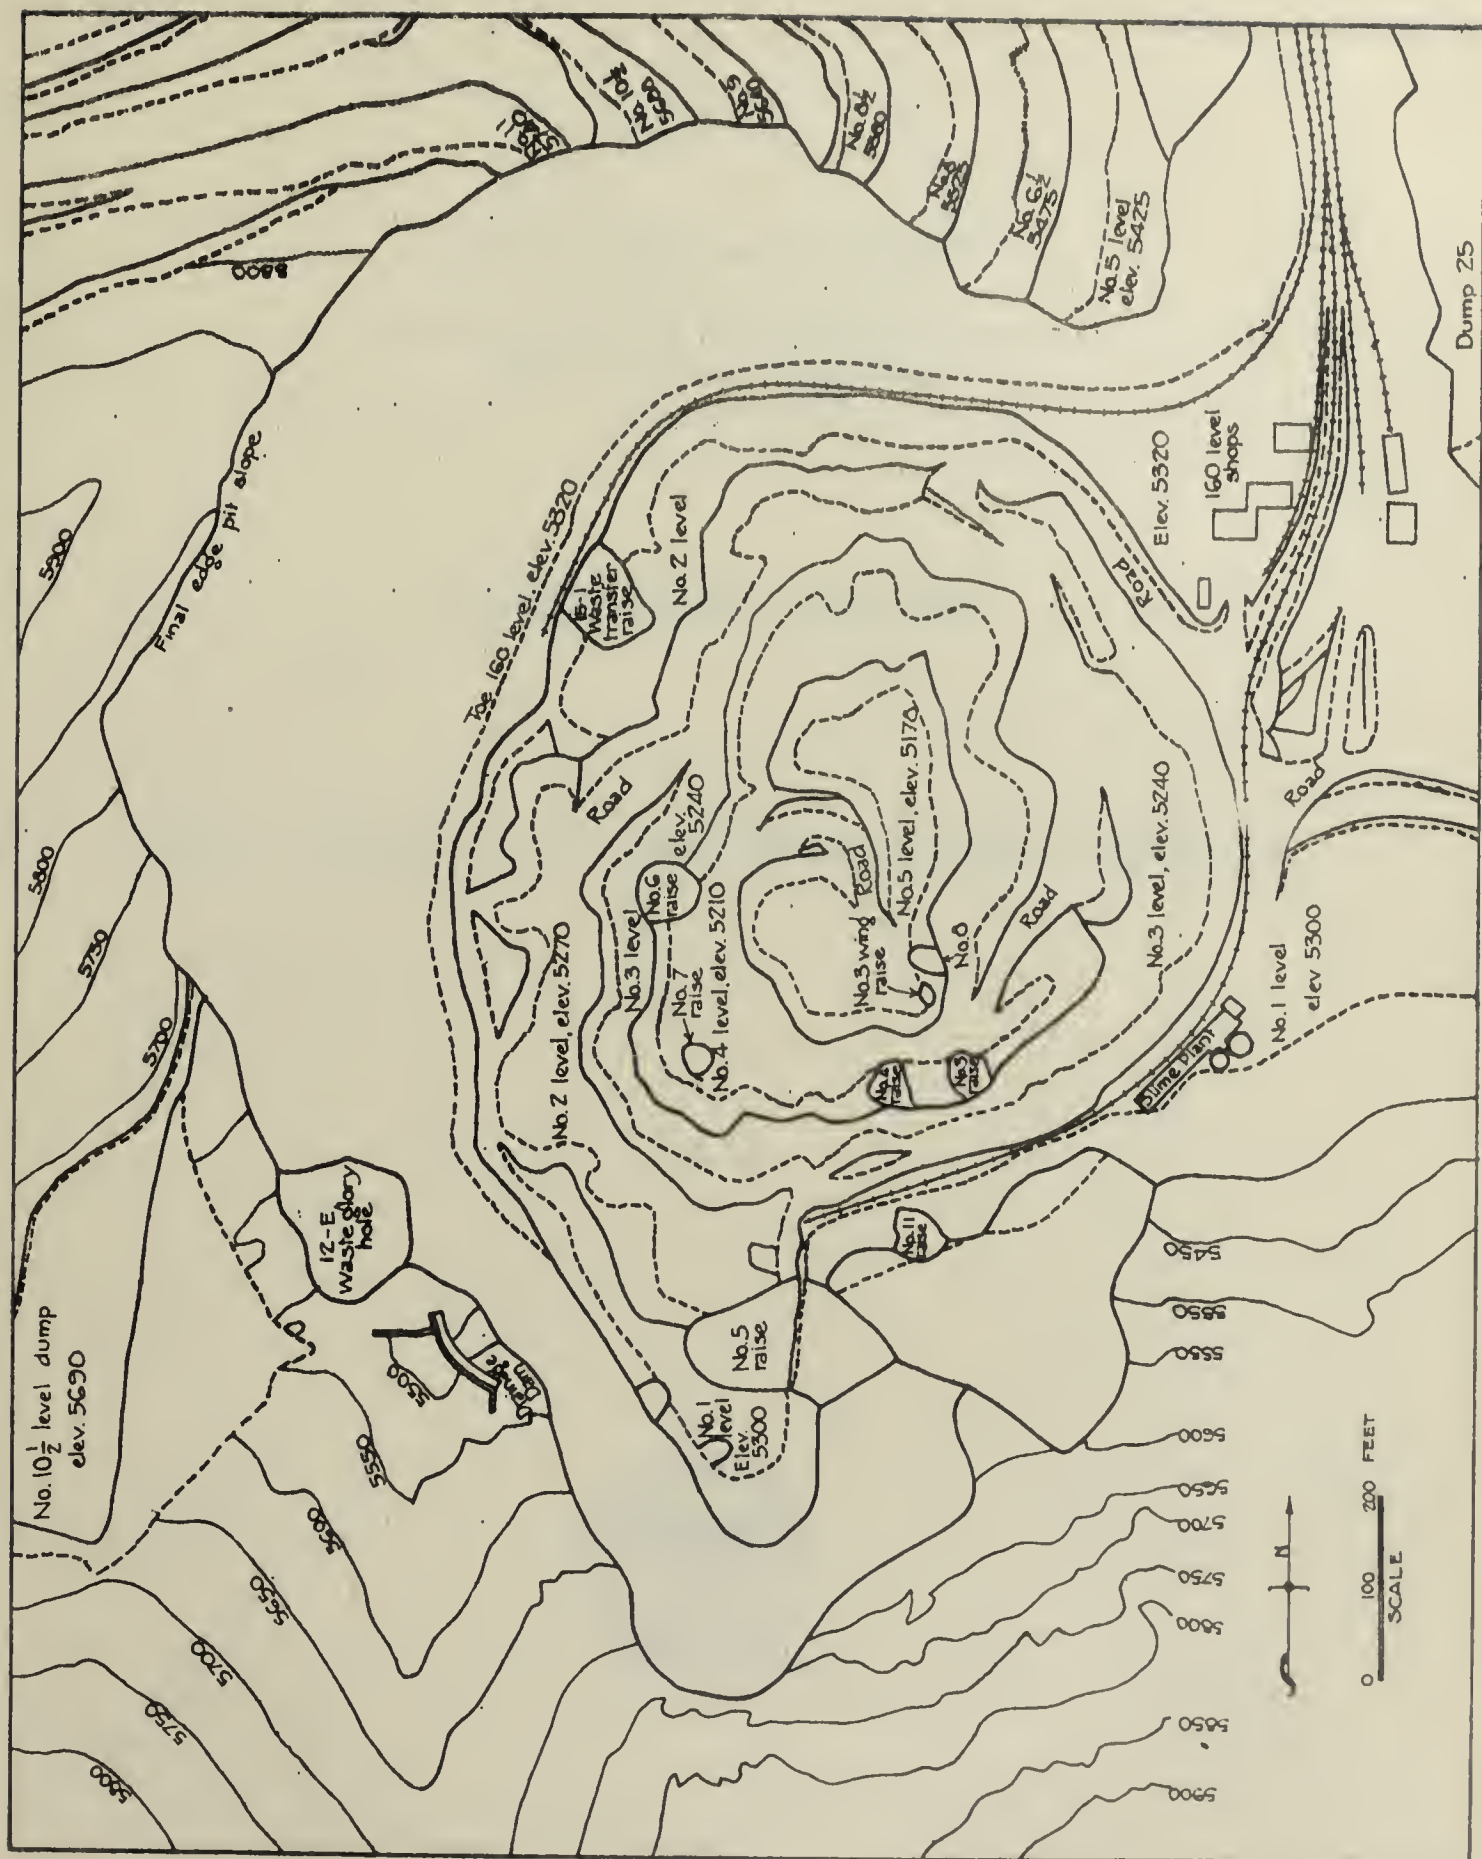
PLAN OF UNITED VERDE PIT, JULY 1, 1929
